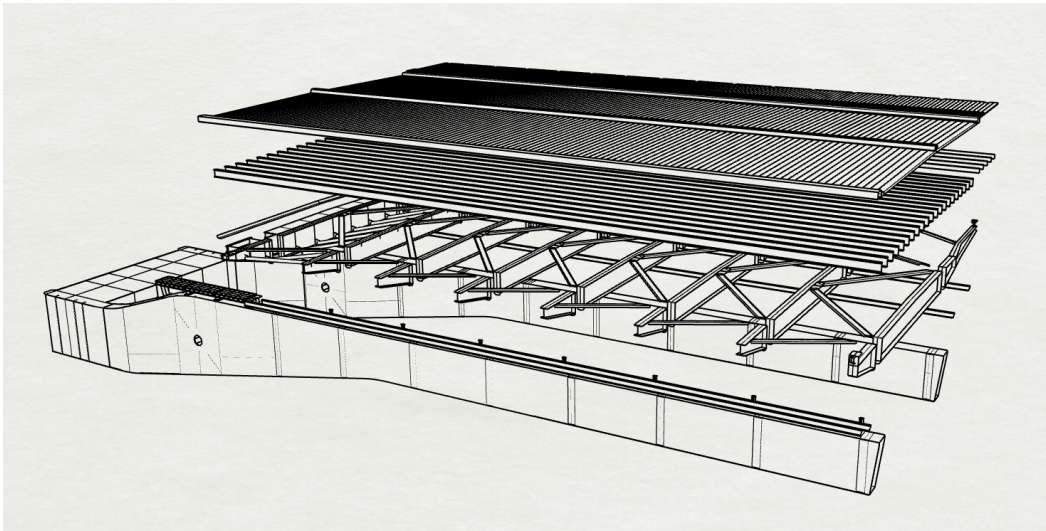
Structural element layers in a movable bridge leaf with a timber deck
